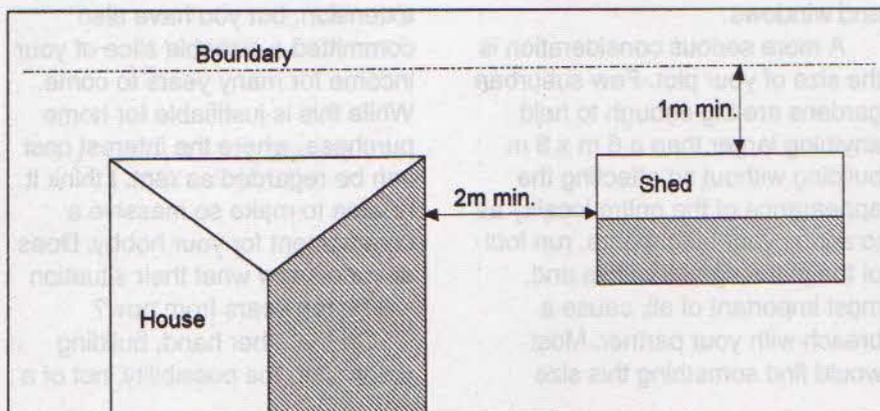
/3 Sectional timber sheds provide a low-cost site for a layout. Classed as temporary buildings, they are not tightly regulated, but need to be sited at least 2 metres from the house and 1 metre from the boundary fence. This allows one to get to the back for maintenance, an essential matter if the 'temporary' building is to last for 50 years.
